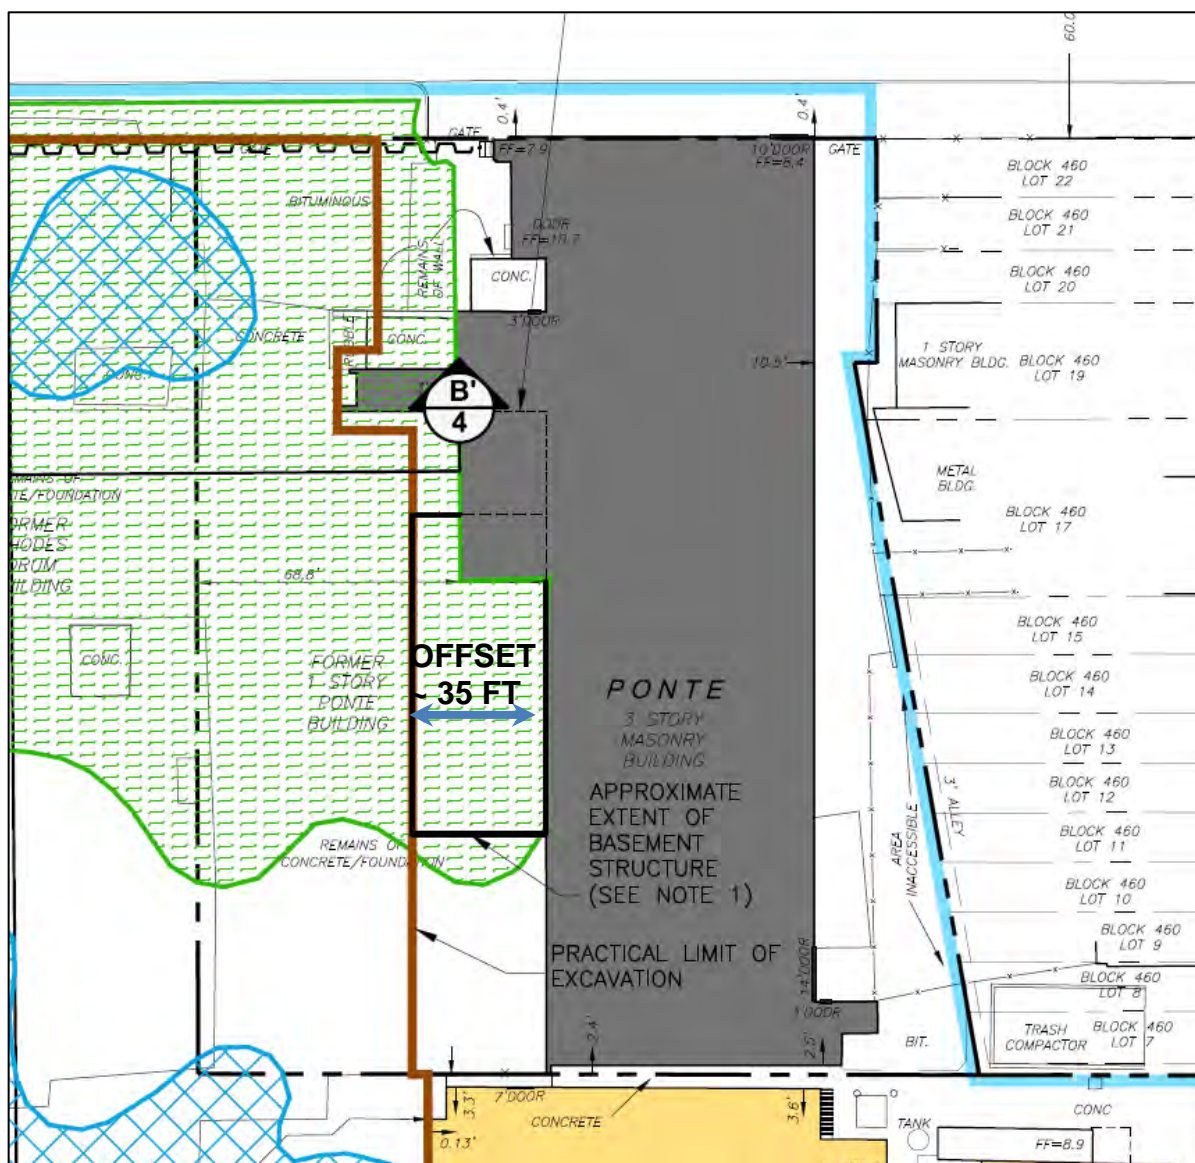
Offset to Practical Limit of Excavation from Ponte Equities Building
